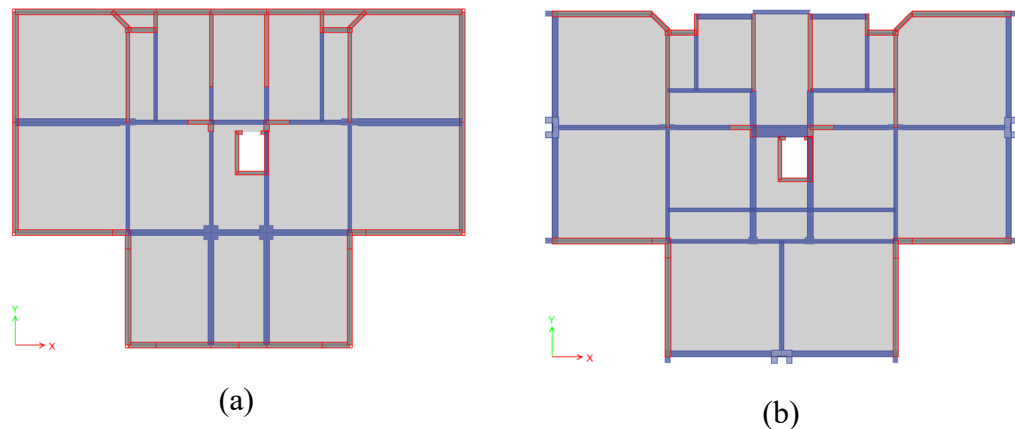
Floor plan views of the (a) first basement and (b) typical (fourth floor) floors for the post-retrofit model.
